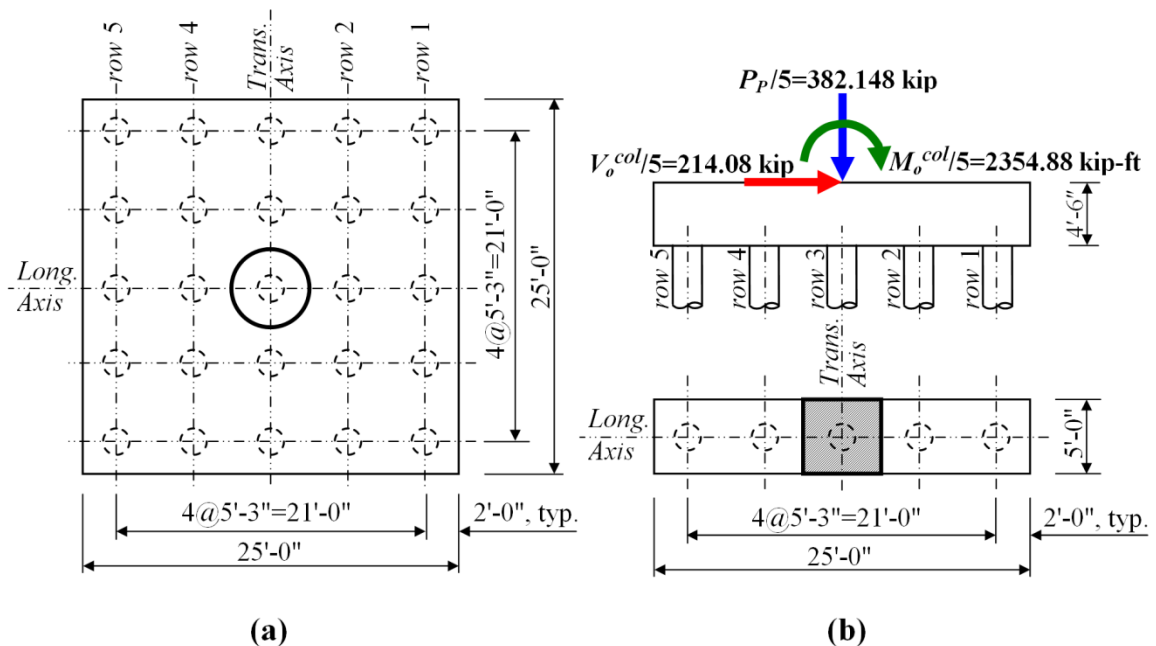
Shaft Group Foundation Schematic Plan Views
